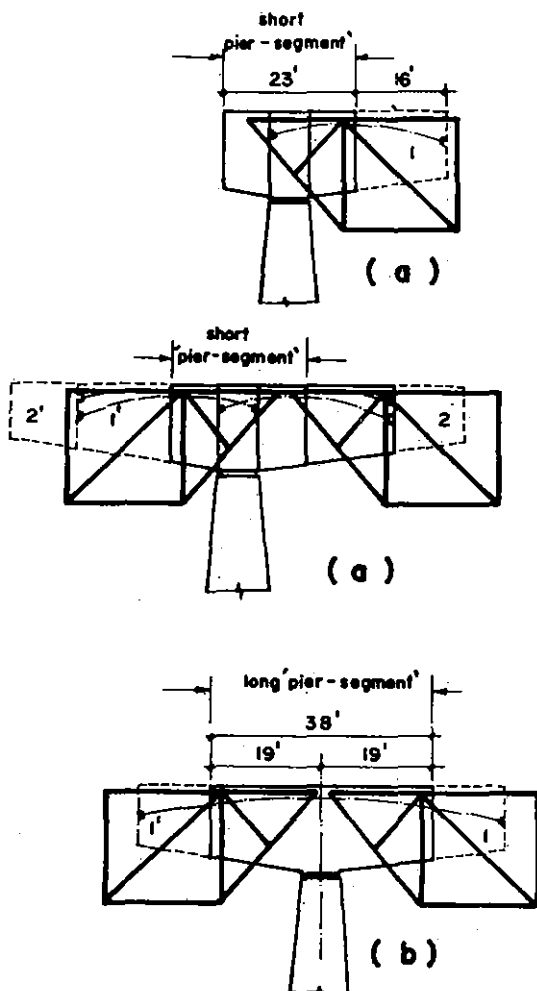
Start of cantilever construction from the pier-segment. (a) Short pier-segment—successive installation of travellers. (b) Long 'pier-segment'—simultaneous installation of travellers
